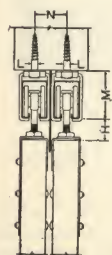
Cross-Section showing overhead bracket attachment with weatherstrip, of two parallel sliding doors.
